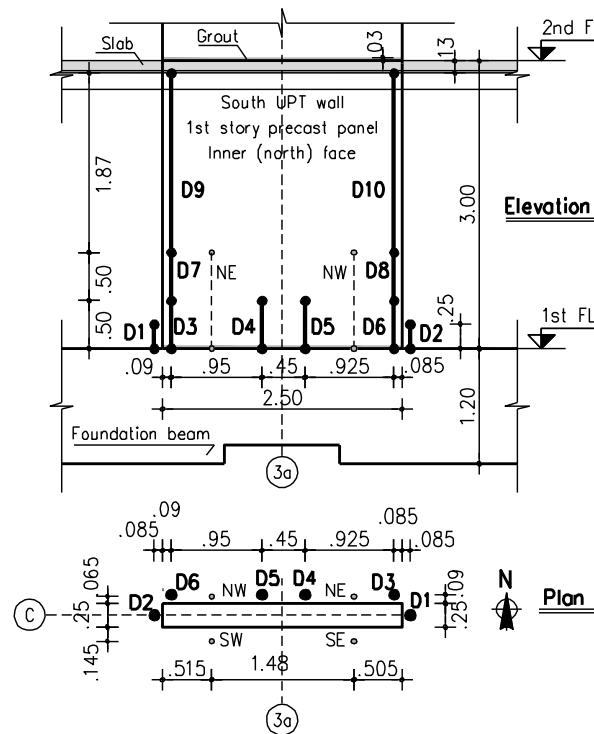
Instrumentation at first story panel of south UPT wall (dimensions in m)
